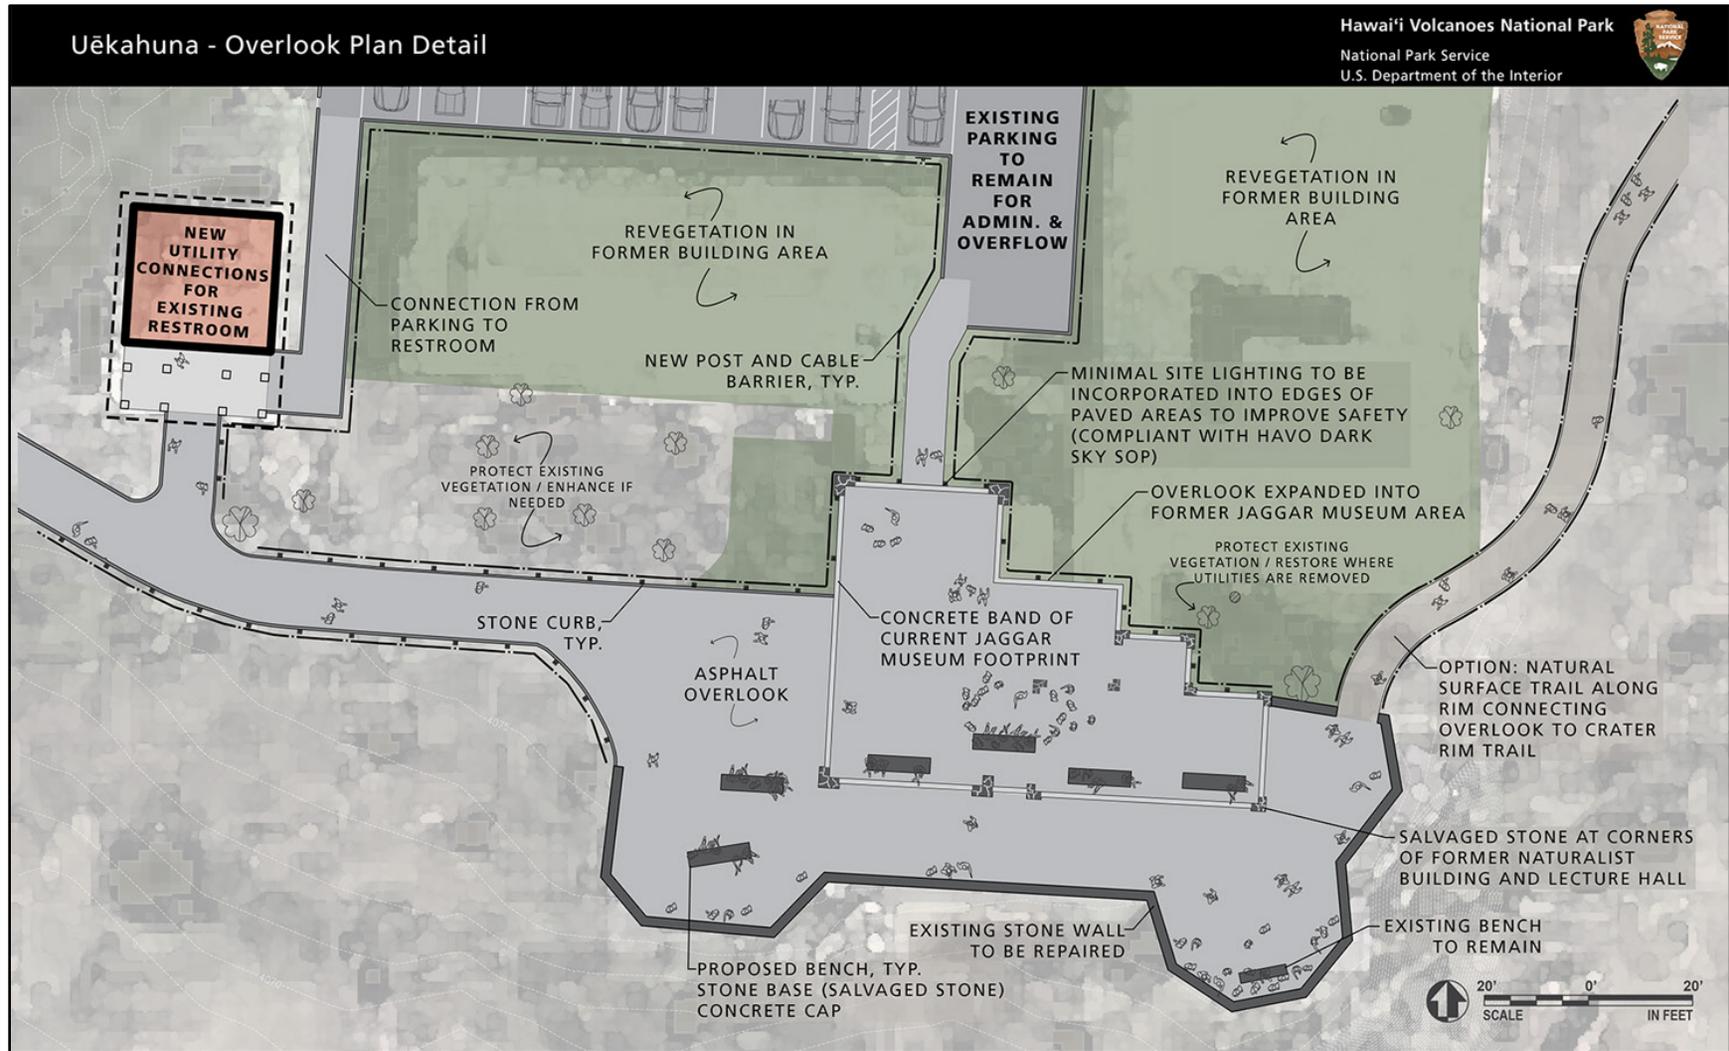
Proposed Action – Uēkahuna Overlook Plan Detail
